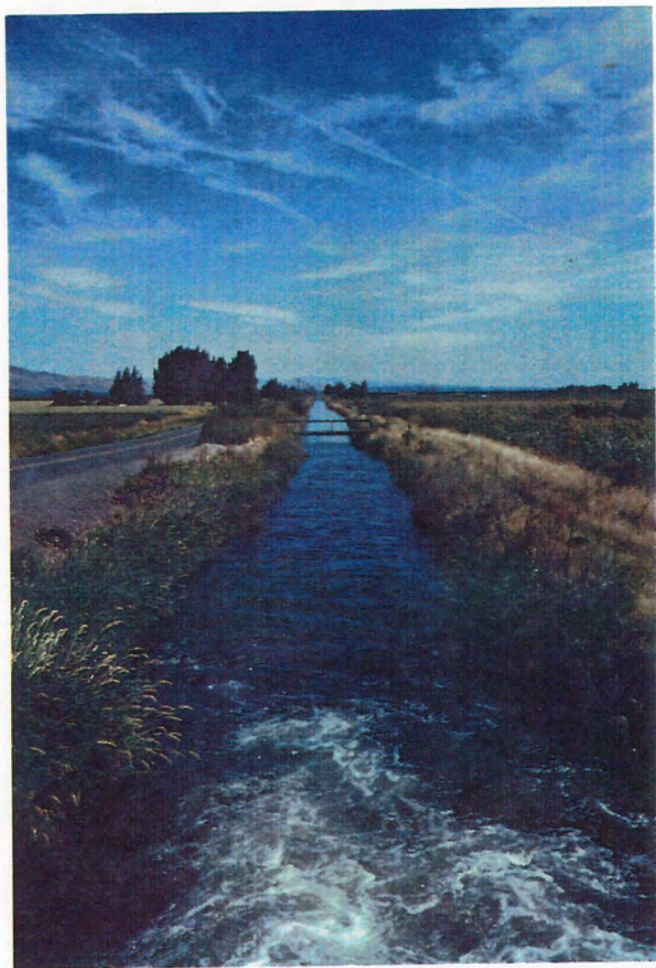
General view of a bridge current meter rating section in Track Lateral
